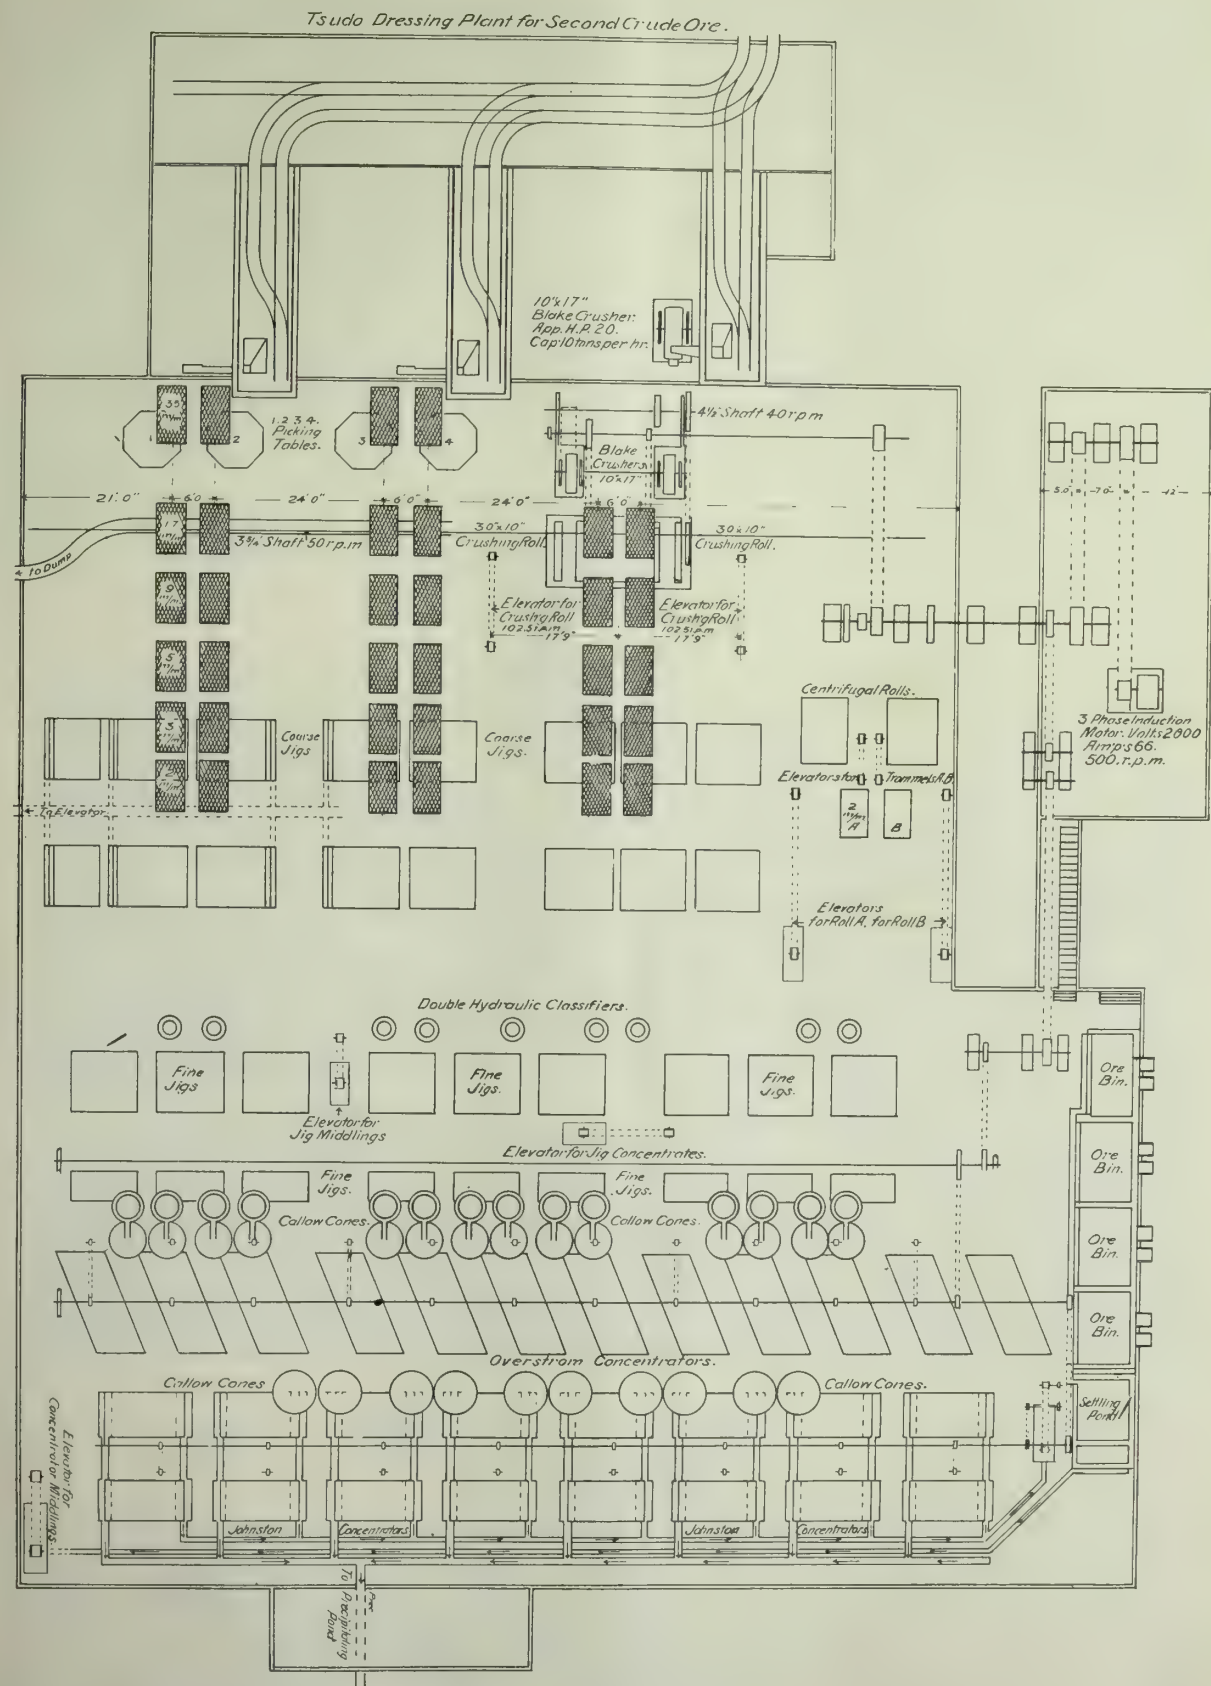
GROUND PLAN OF TSUDO MILL, ASHIO, JAPAN.
